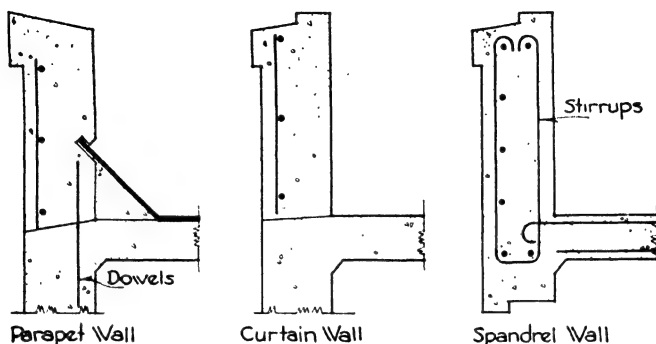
Parapet, Curtain and Spandrel Walls.
